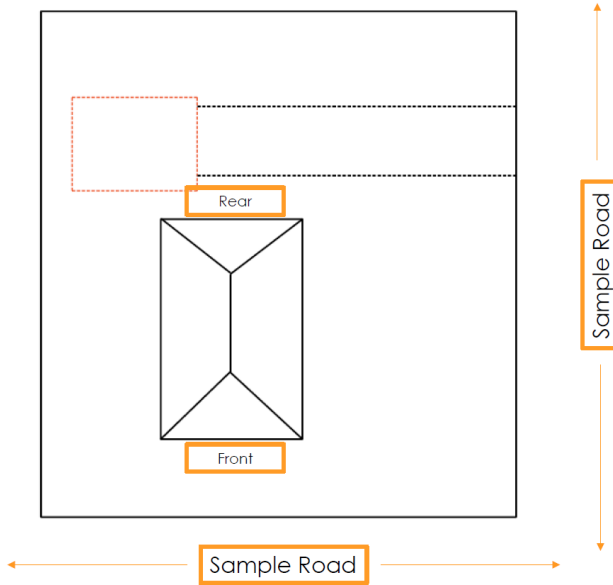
Example of appropriate new outbuilding placement on a corner property with side yard driveway access
